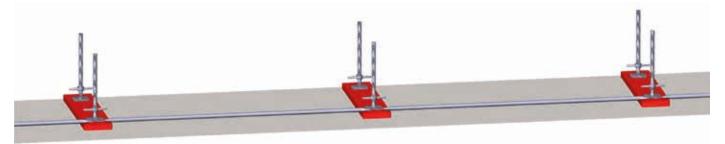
Placing scaffolding on sole boards on the levelled ground with guardrails marking the spacing between sole boards.
